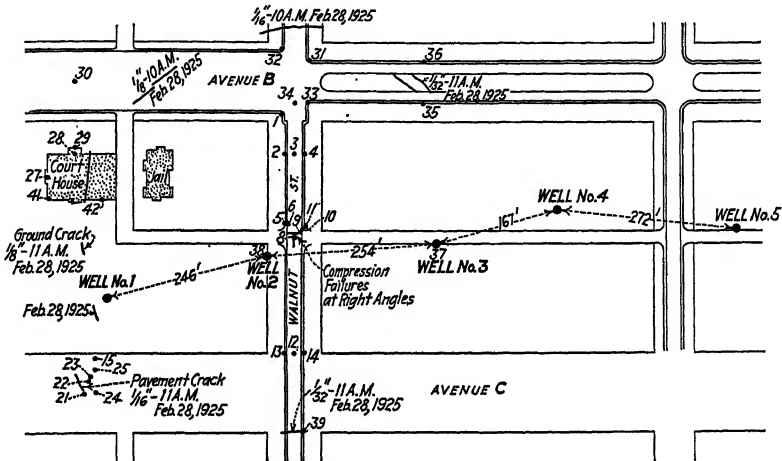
LOCATION OF WELLS, SURFACE CRACKS, AND COMPRESSION FAILURES.
